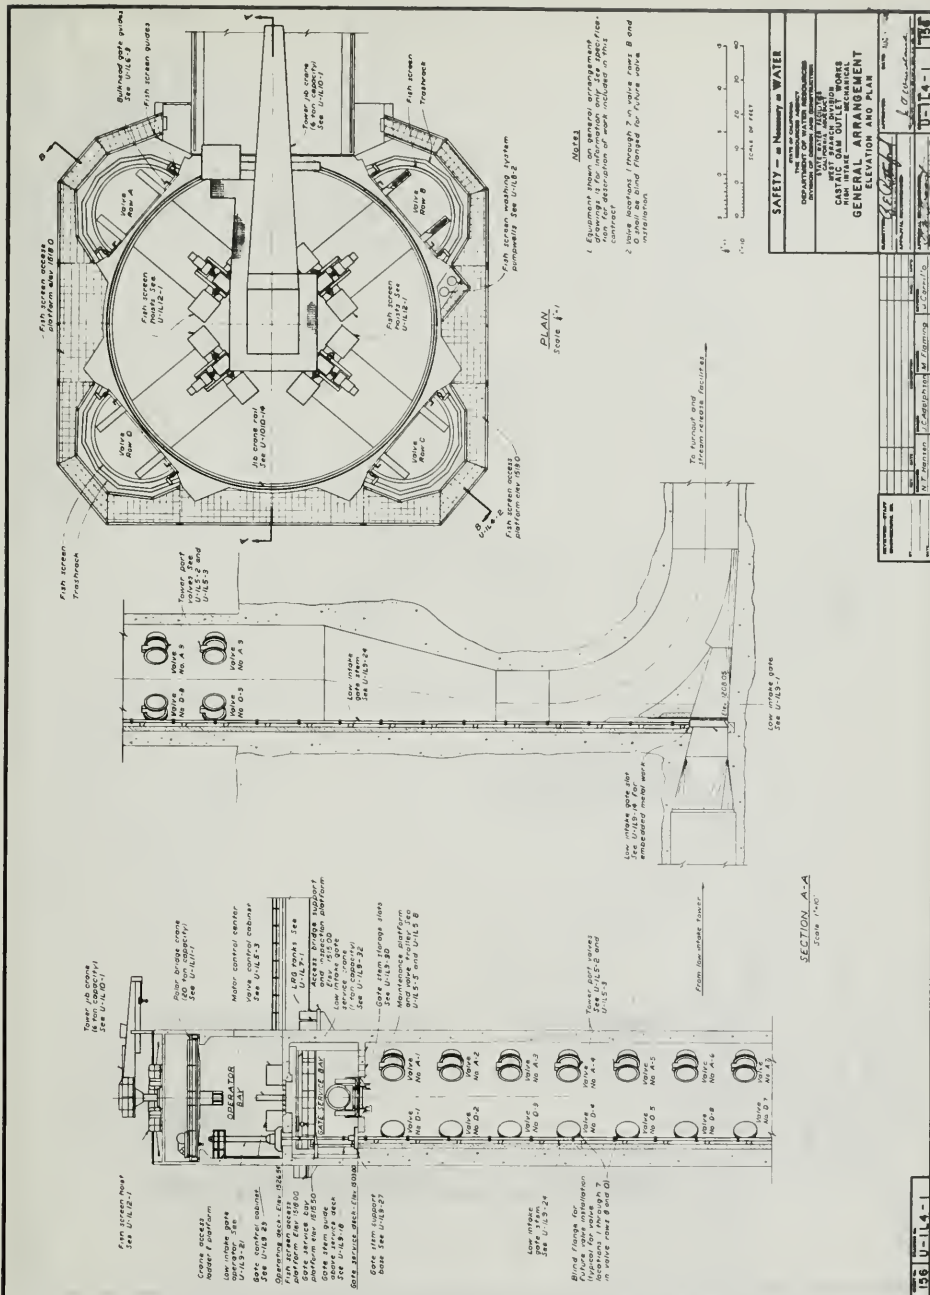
General Arrangement of Tower Mechanical Features—Elevation and Plan
